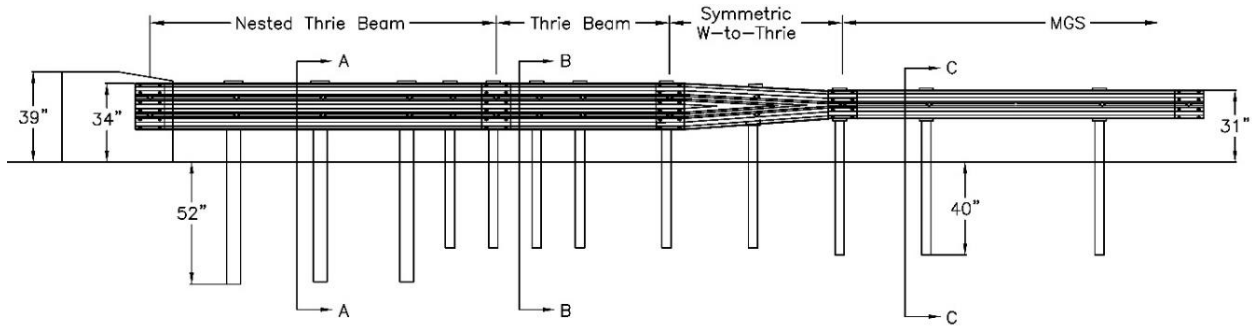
34-in. Thrie Beam to End Buttress Connection Drawing [36]
